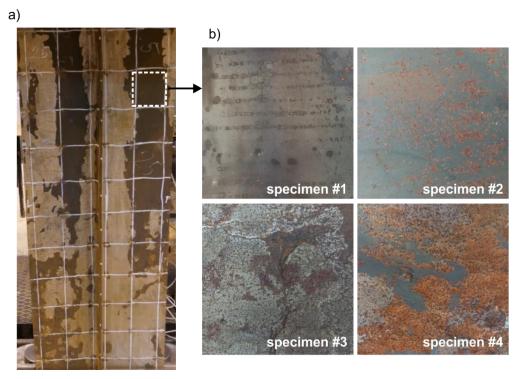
Corroded specimens: a) specimen with 21 % degradation level and b) surfaces of corroded specimens
